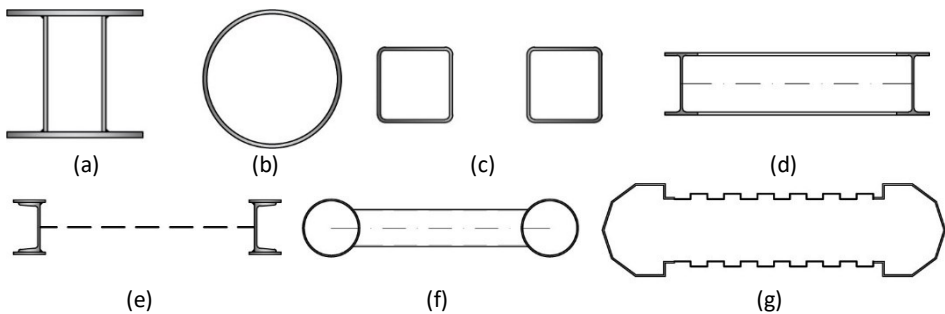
Cross-sections of billboard poles: (a) a massive box cross-section, (b) a circular hollow section, (c) two square hollow sections, (d) two hot rolled I sections with a horizontal strut, (e) two hot rolled U sections with truss bracing, (f) two circular hollow sections and a horizontal strut, (g) two cold-formed sections in the form of a half polygon.
